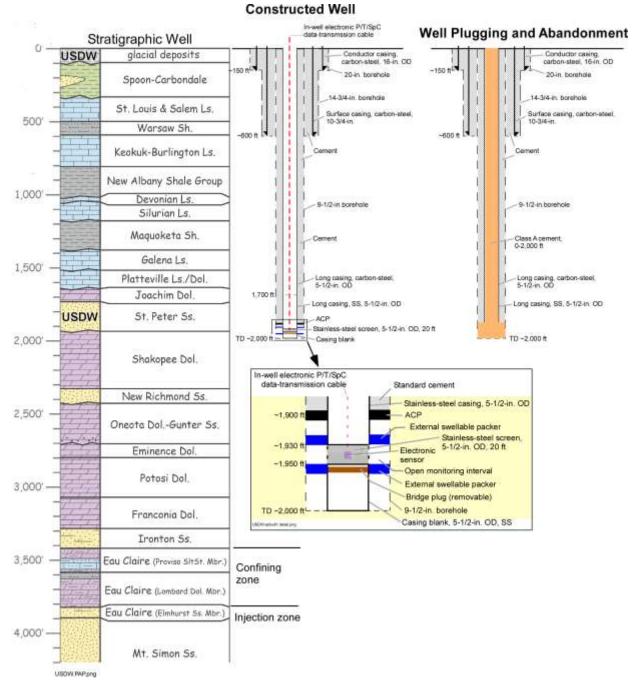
Construction design and plugging and abandonment plan for the USDW monitoring well.
